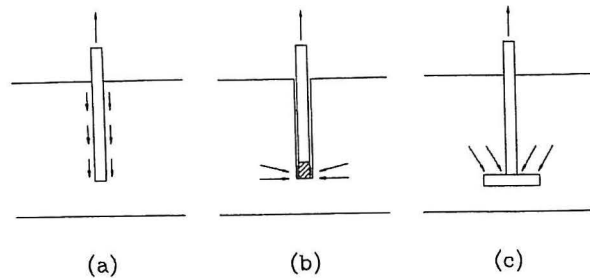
Different ways of transferring the load from the anchor bolt to the concrete, a) adhesive anchor, b) expansion anchor and c) hook anchor.
